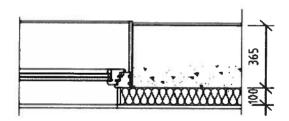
Window detailed concrete wall with frame insulation (wall type 1)
